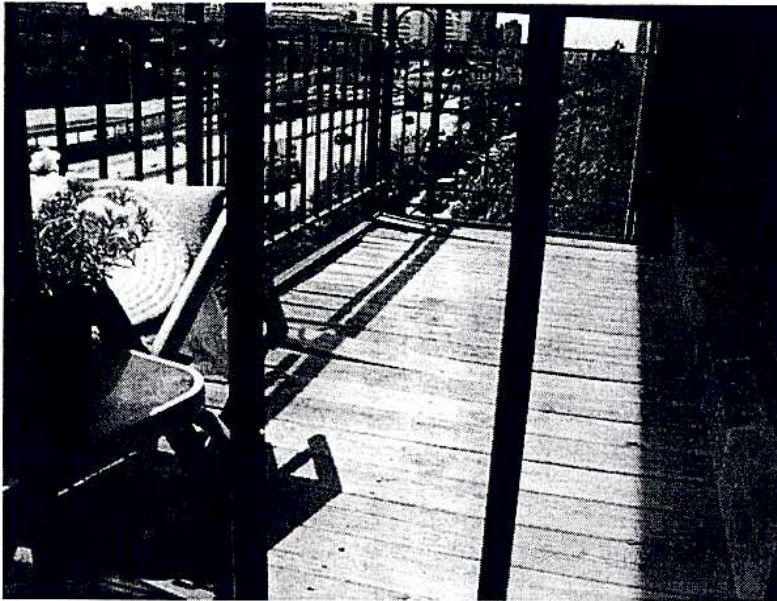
Wood decking curling where nails are no longer anchored into nailer below
